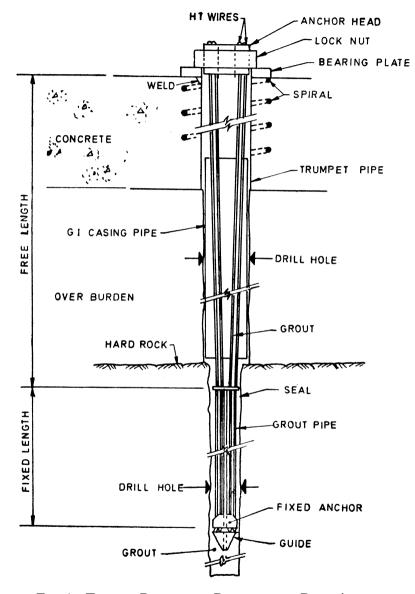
TYPICAL DETAILS OF PRESTRESSED ROCK ANCHOR
